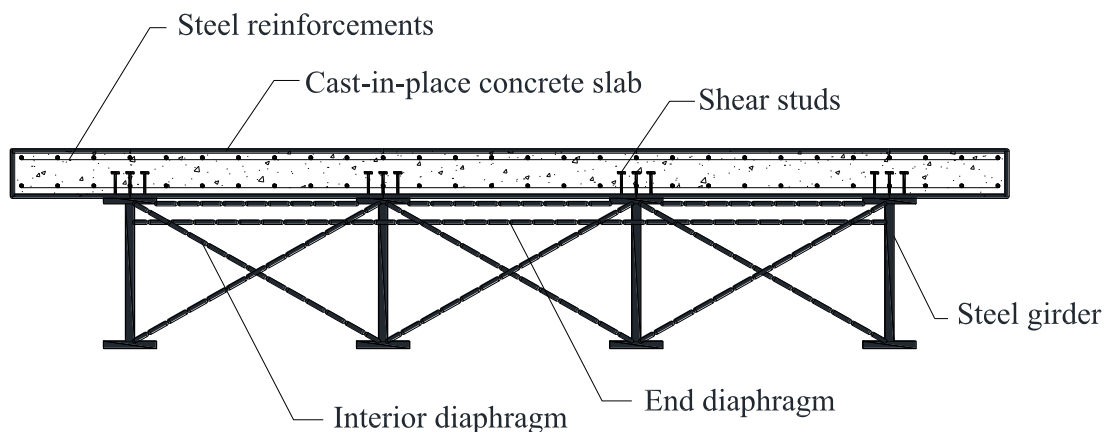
Typical cross-section of RC bridge deck specimen (adapted from Fang et al. 1990)
